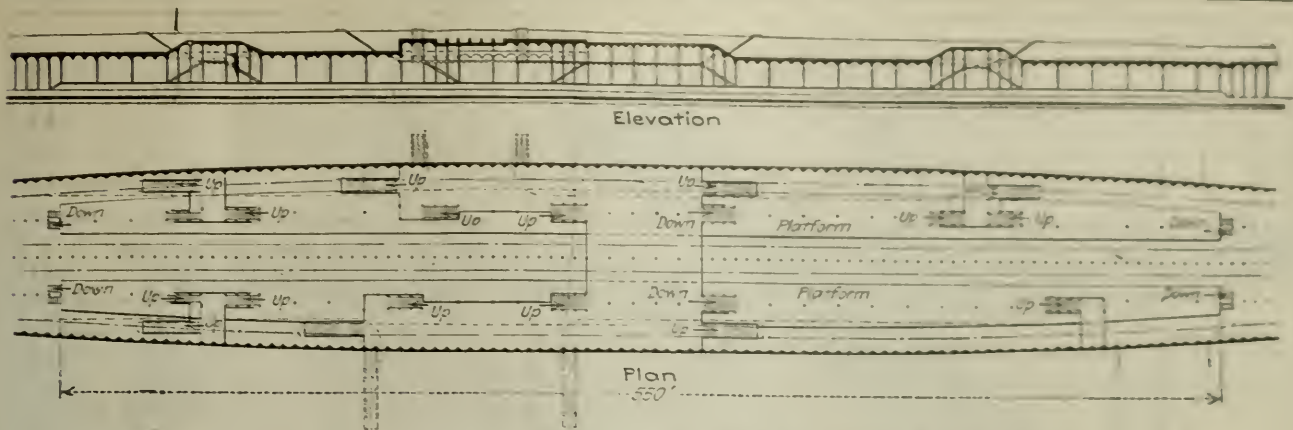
GIRARD AVENUE SUBWAY STATION, PHILADELPHIA
